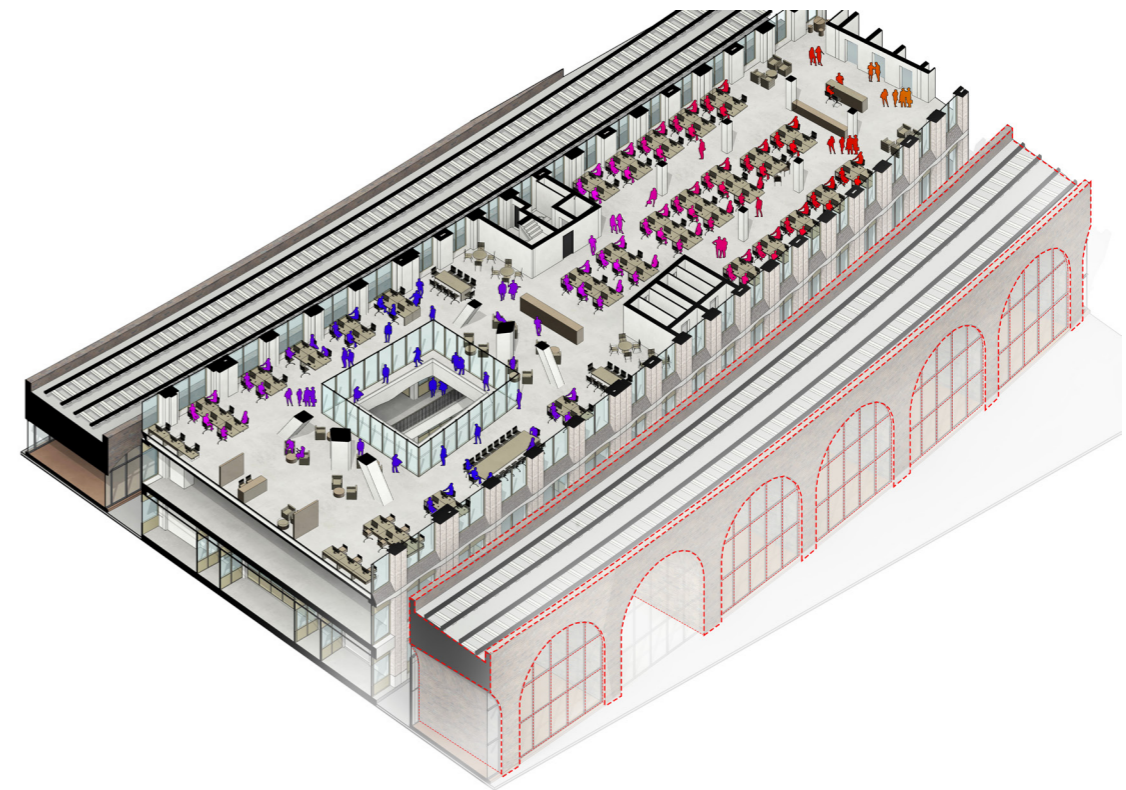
Publicly Accessible Open Space second floor axonometric diagram
